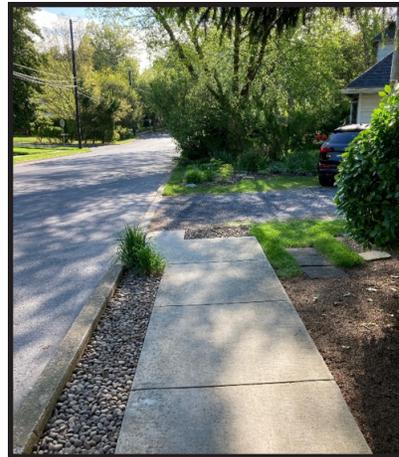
Sidewalks should be on both sides of the street and continuous. A gap in the sidewalk network leads pedestrians into conflicts with traffic.
